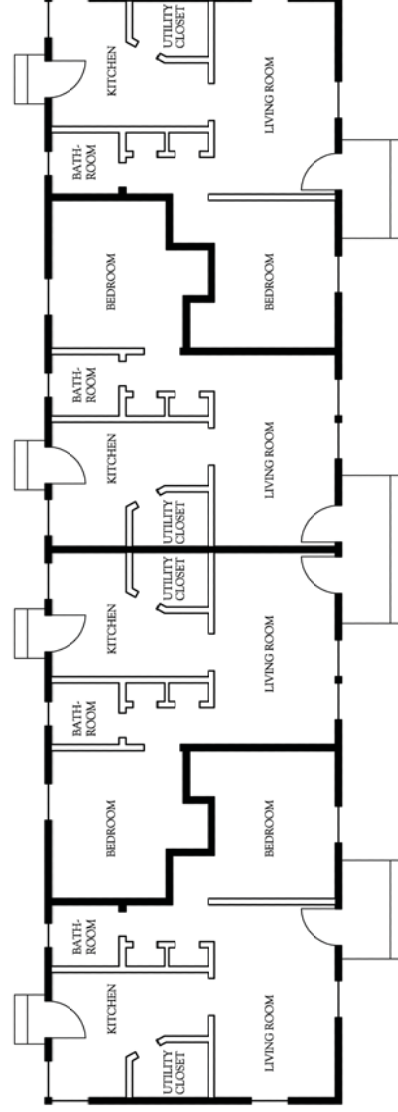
Floor plan of Residential Unit Type 1 (not to scale).
